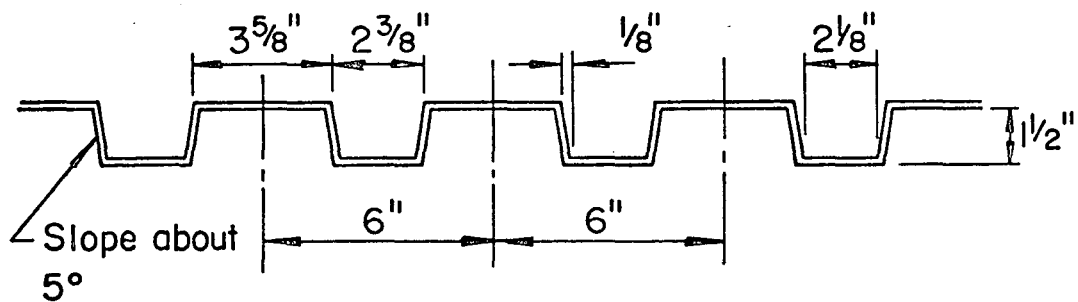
DETAIL OF METAL DECKING (GAGE 20)
